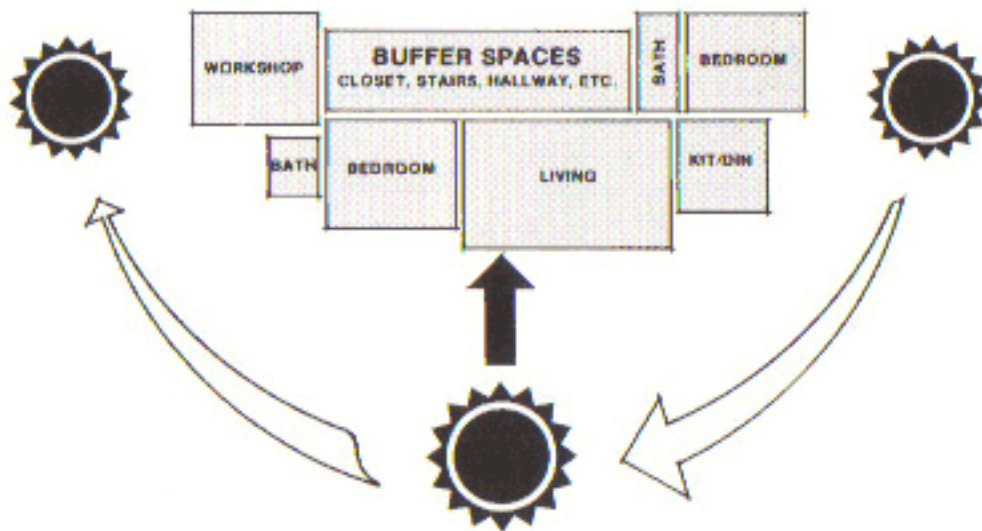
Interior Space Arrangement with habitable space along South and buffer zone along North walls
